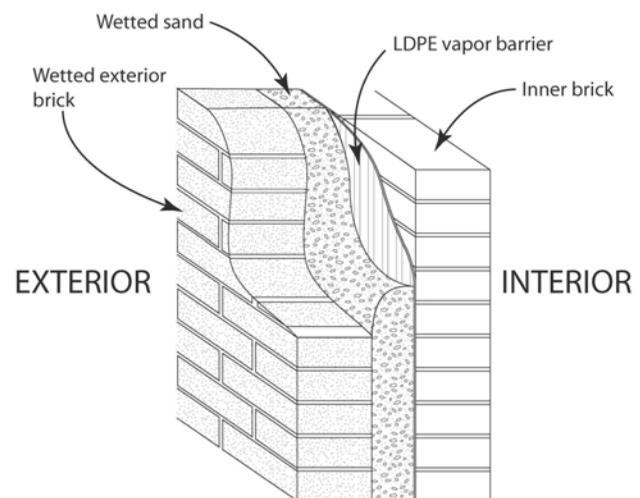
A brick-sand-brick design for the walls of an EC room, commonly used in India. In this concept, the exterior wall is composed of a high porosity brick (Chopra *et al.*, 2008) with a water barrier between the wetted sand and the inner wall to prevent free water migration to the room interior.
